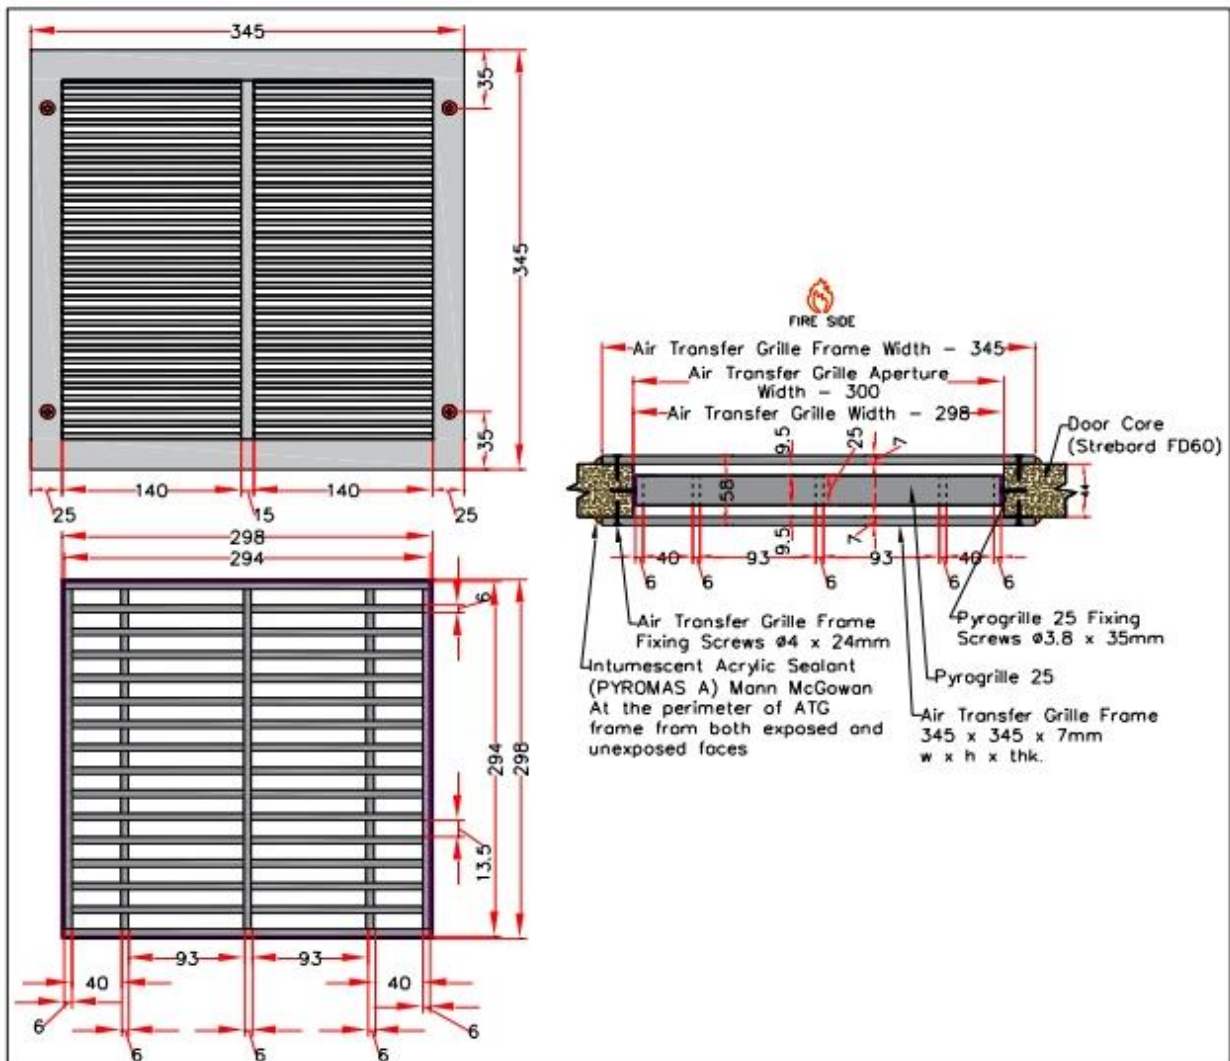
Vertical section of the upper Air Transfer Grille of doorset B (Section 2 from Drawing 14).
